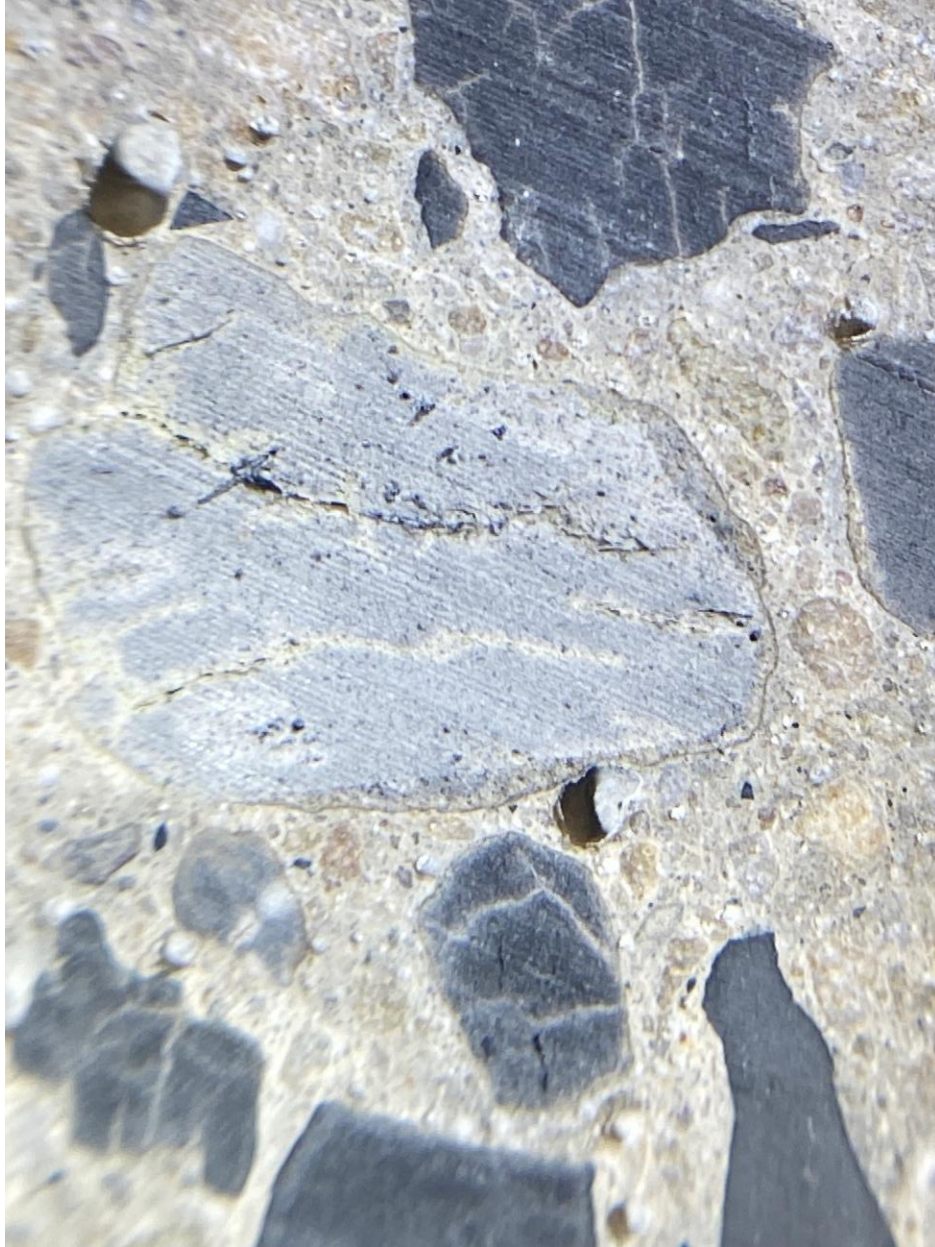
Aggregate in core 3 of lightweight concrete deck at bridge C-1011 (1).
